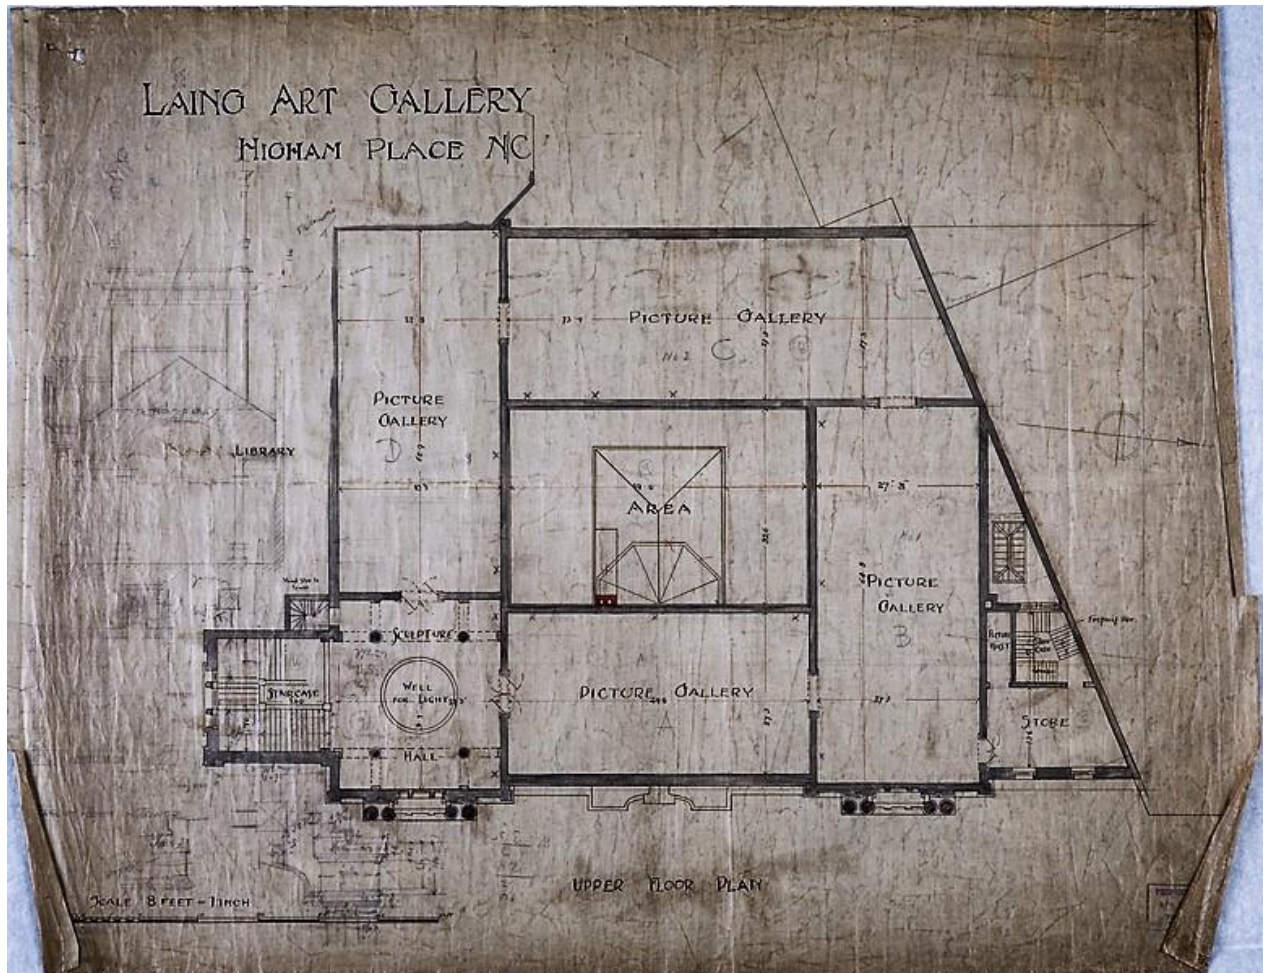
Laing Art Gallery upper floor plan. Cackett and Burns Dick, 1901.
